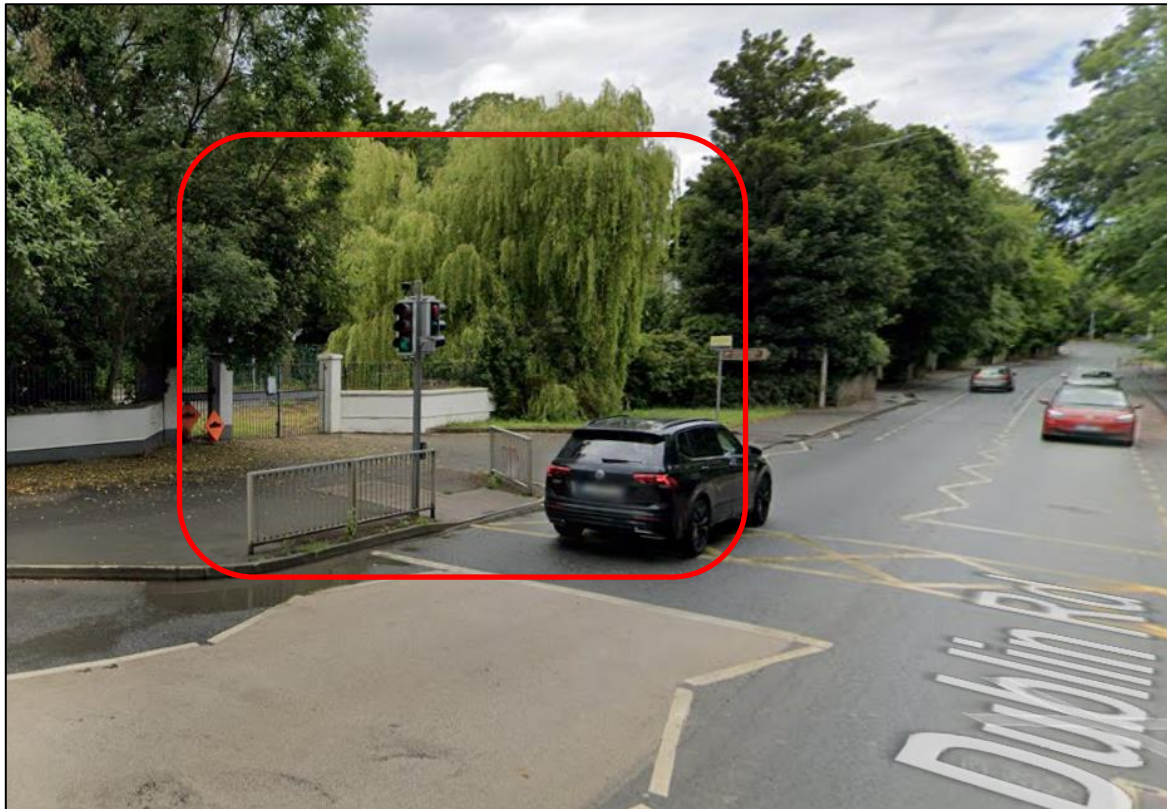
Existing street view at Dublin Road (Woodbrook college) (Image Source: Google)
